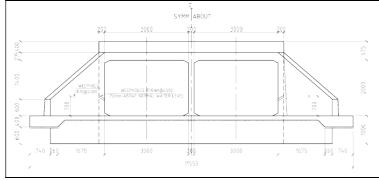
Box Culvert (3.0 x 2.0-2)
